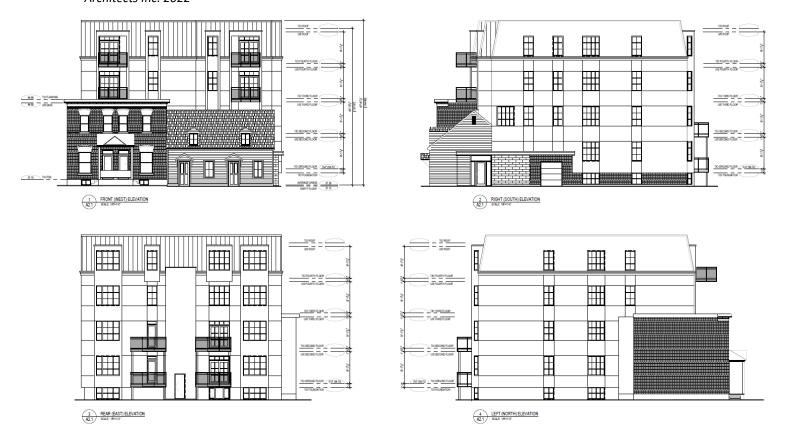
Elevations of the development. Note the modified mansard treatment of the 4^{th} floor. Source: Rosaline Hill Architects Inc. 2022
